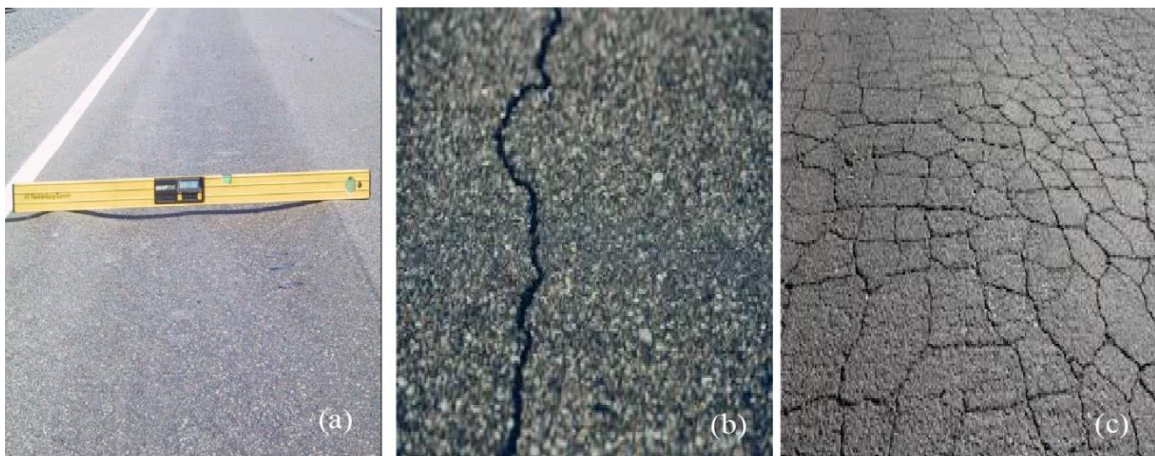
(a) Rutting (b) Thermal Cracking (c) Fatigue Cracking
